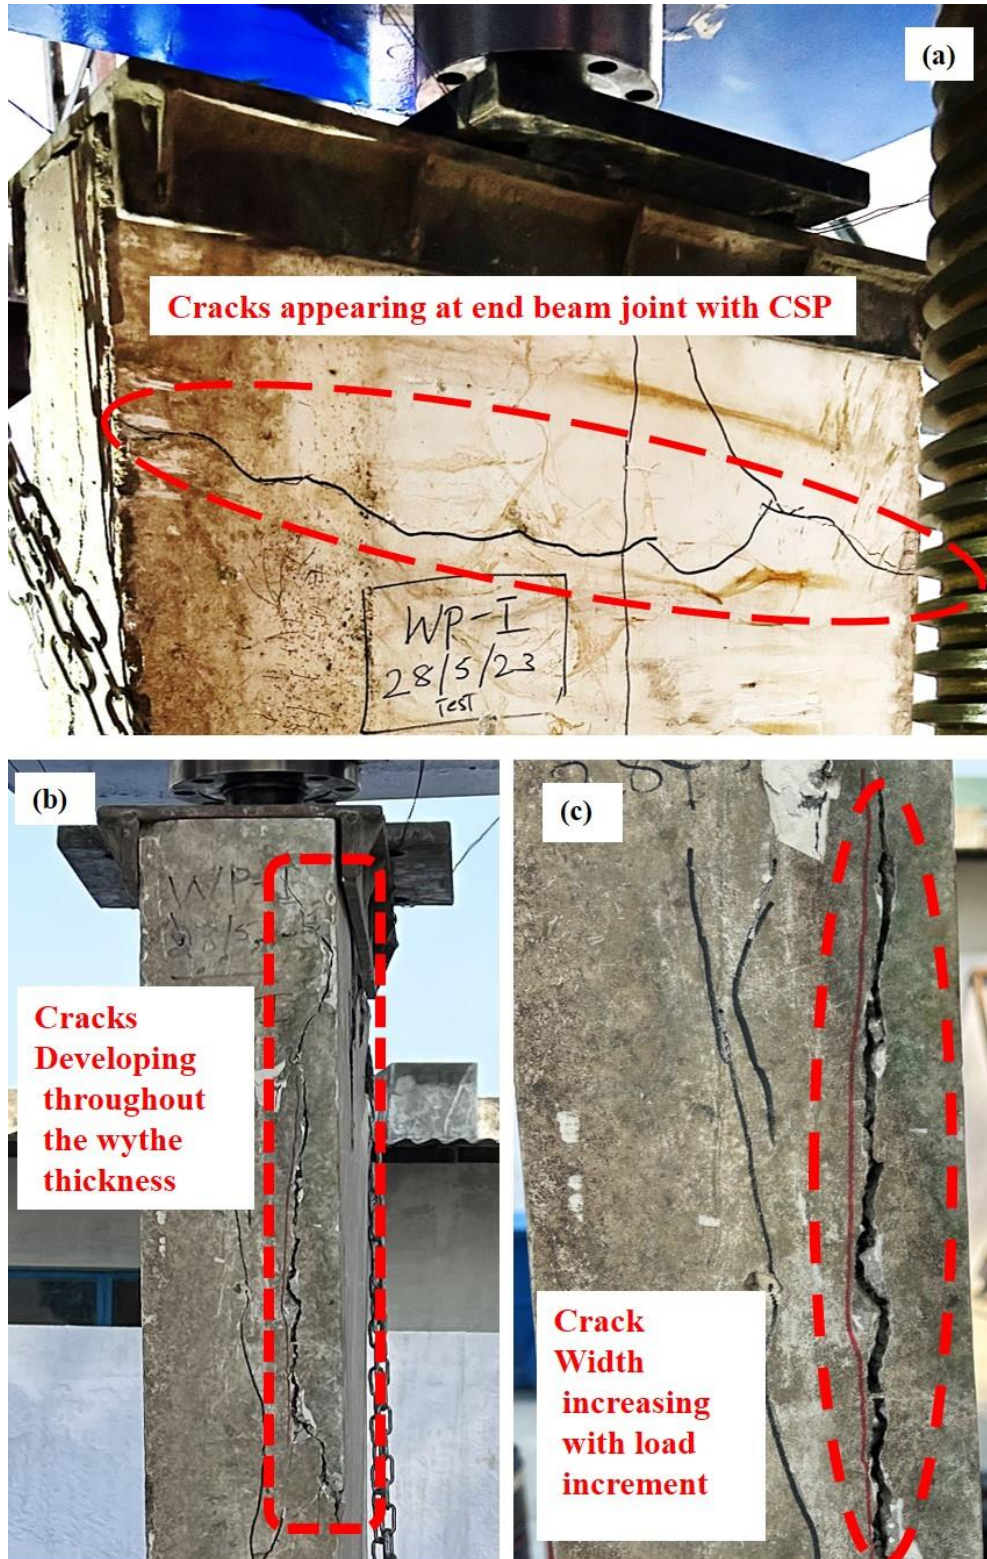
34: Failure of WP1 (a) WP 1 specimen showing the cracks at the joint of top end beam with the concrete sandwich panel; (b) side profile of the specimen WP 1; (c) expansion of crack in post elastic region.
